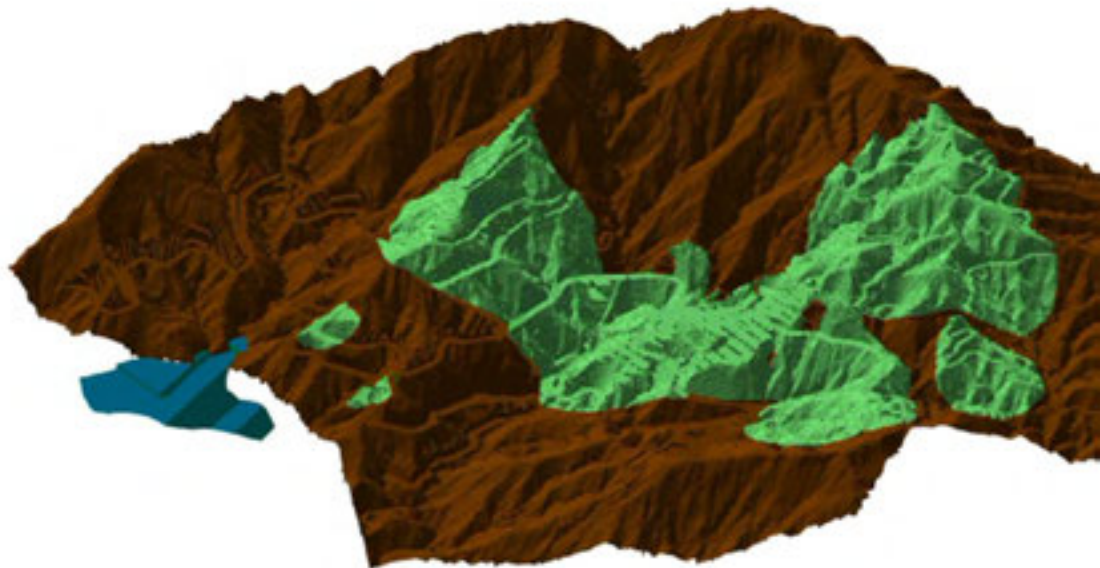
Commencement of Mining after Establishment of Hill Top Access and Haul Road Network (Start of Year 3 – 2022)
